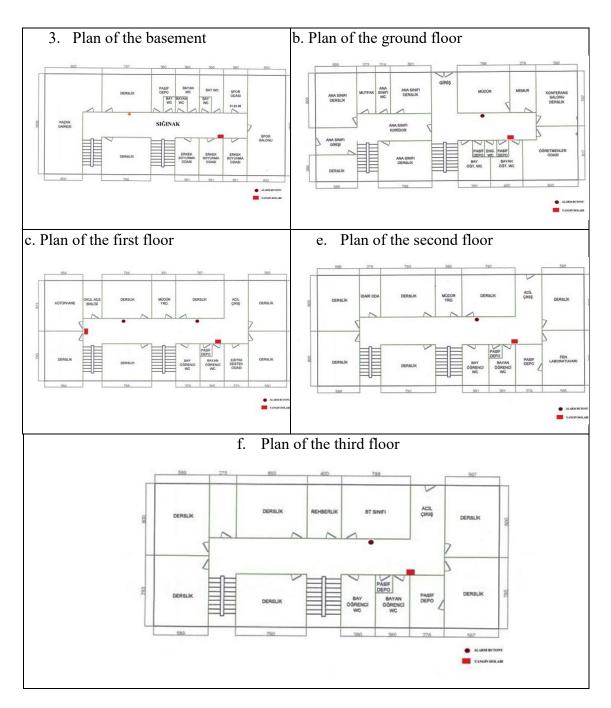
Plan of the 80. Yıl Orhangazi Secondary School, basement floor (a), ground floor (b), first floor (c), second floor (d), and third floor (e).
